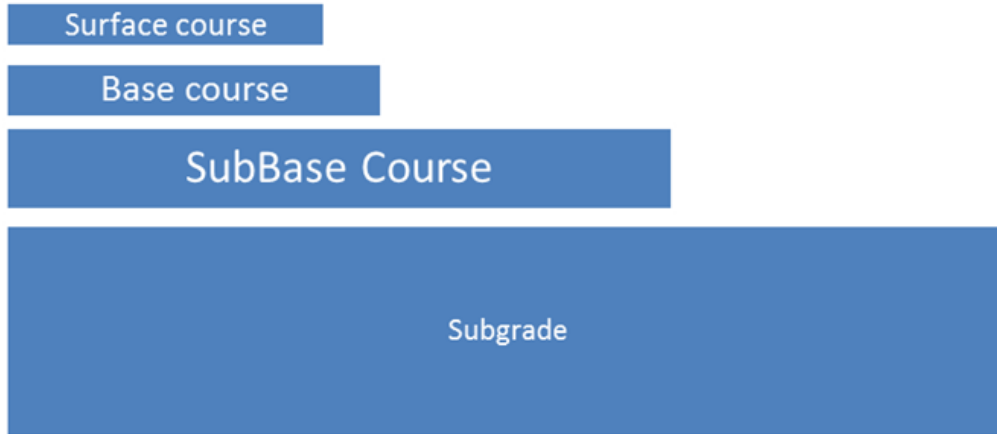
Pavement courses of a typical flexible pavement structure.
